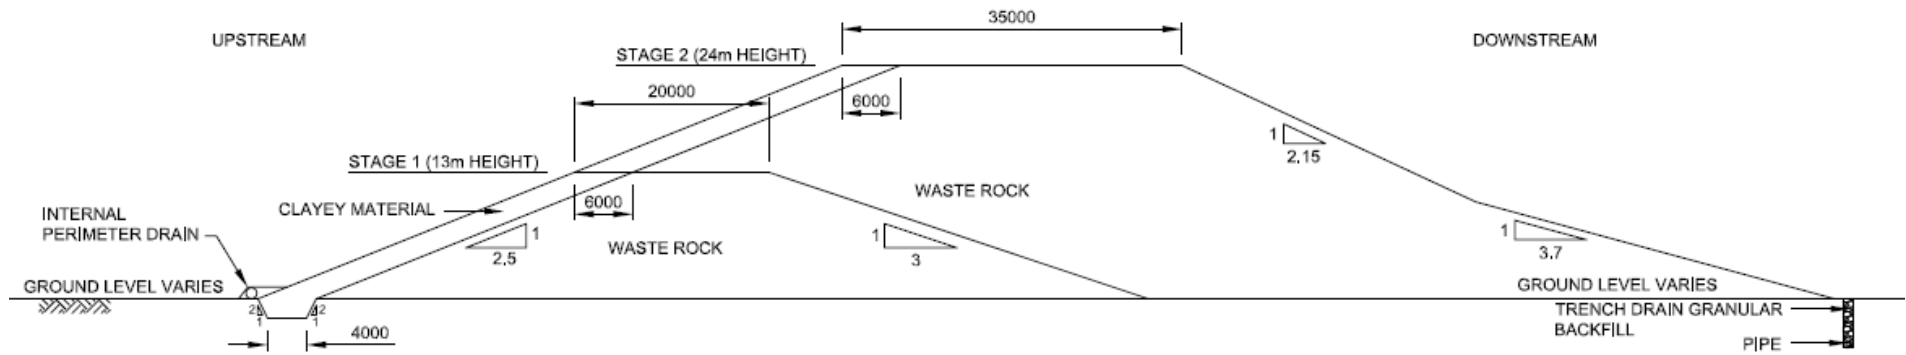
Cross Section of the Proposed Above Ground FRS and Waste Dump Design
